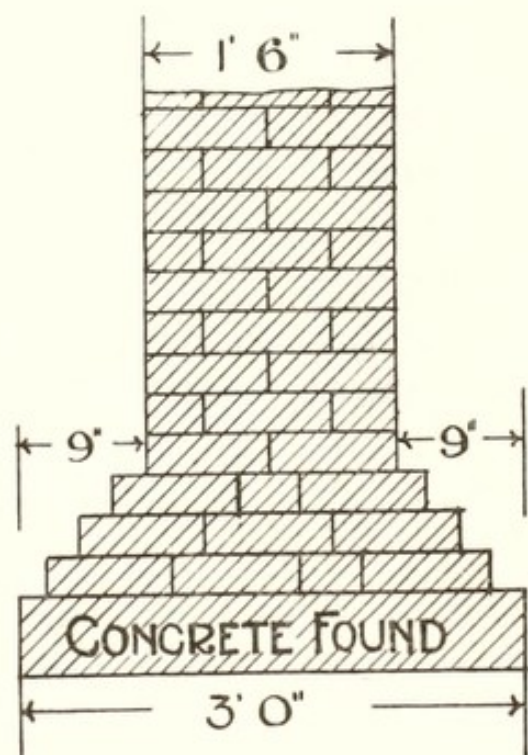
CONCRETE FOUND ON WHICH THE WALL IS BUILT.
